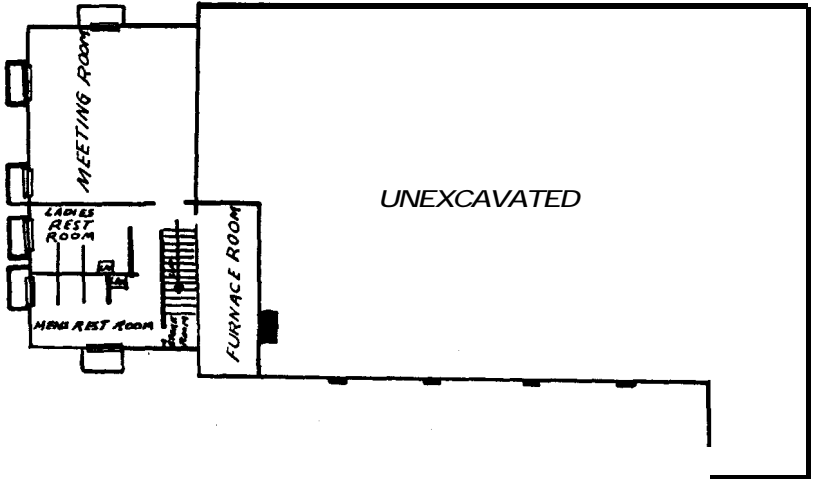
Basement floor plan of the present building at the Rice County Agricultural Center.
